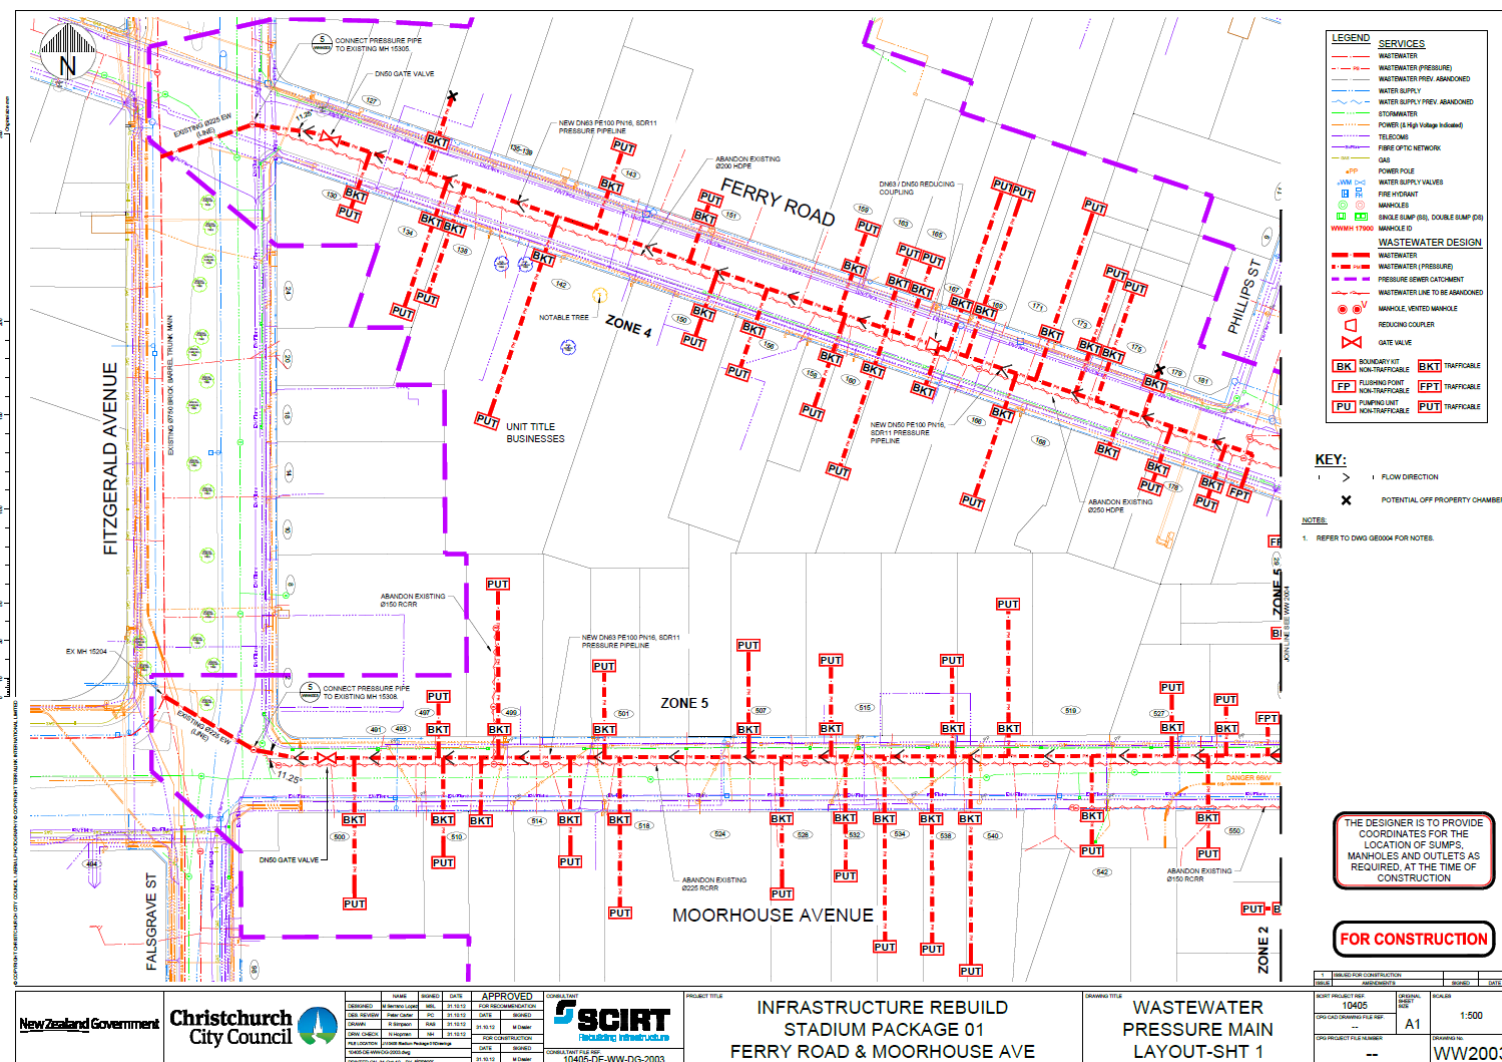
Design Drawing Example (WW Local Pressure Systems)
